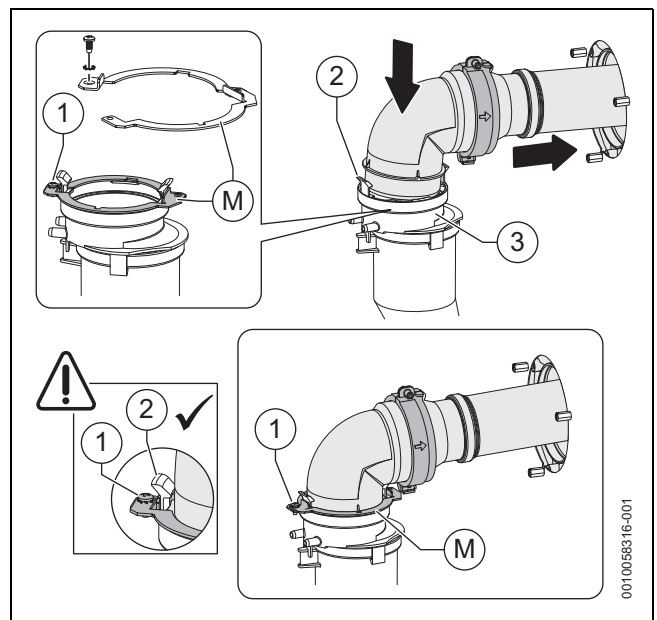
Adaptor assembly fitting to appliance exhaust outlet
